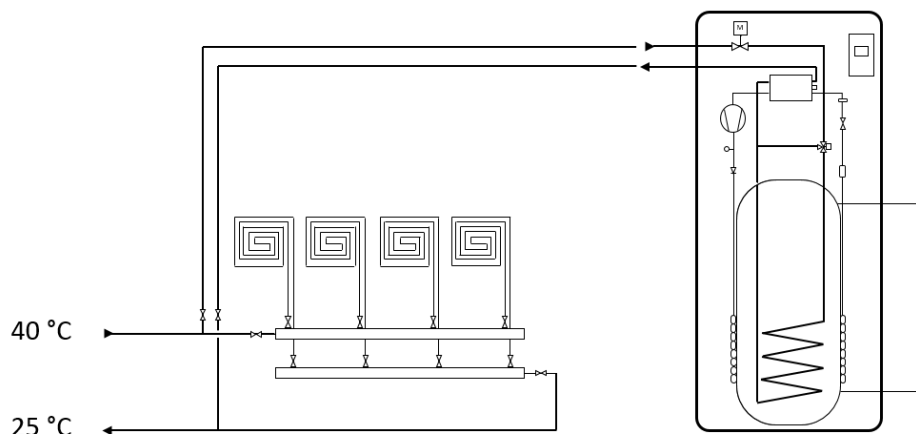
Booster HP with DHW storage on the secondary – Parallel connection to floor heating system
